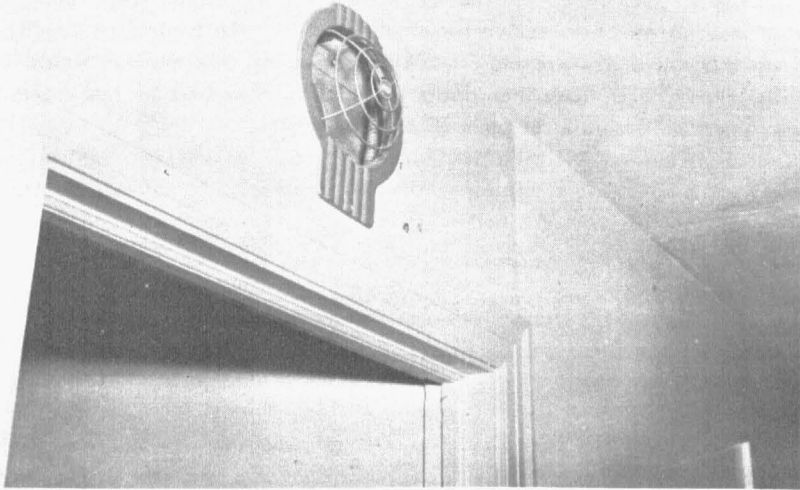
A fan built into the wall above a door can move warm air into an outlying room. Fans are manufactured and sold expressly for this purpose.
